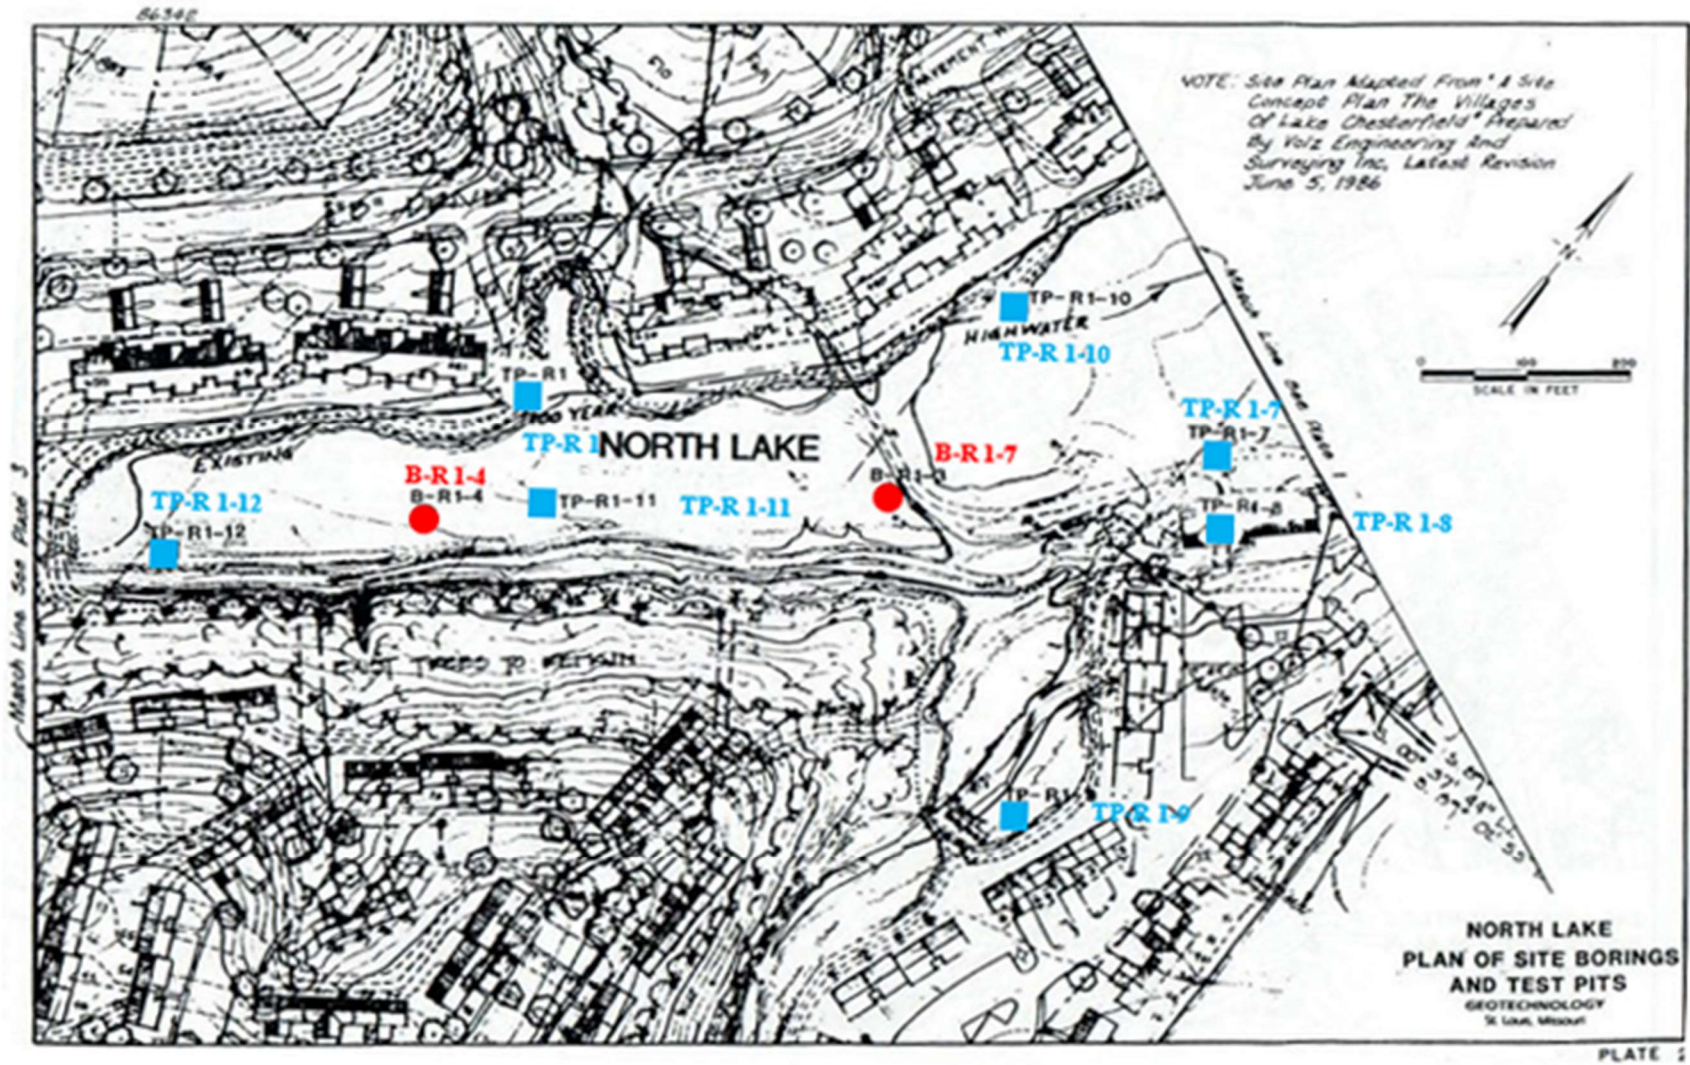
North Lake plan of site borings and test pits (Geotechnology, Inc., 1986).
